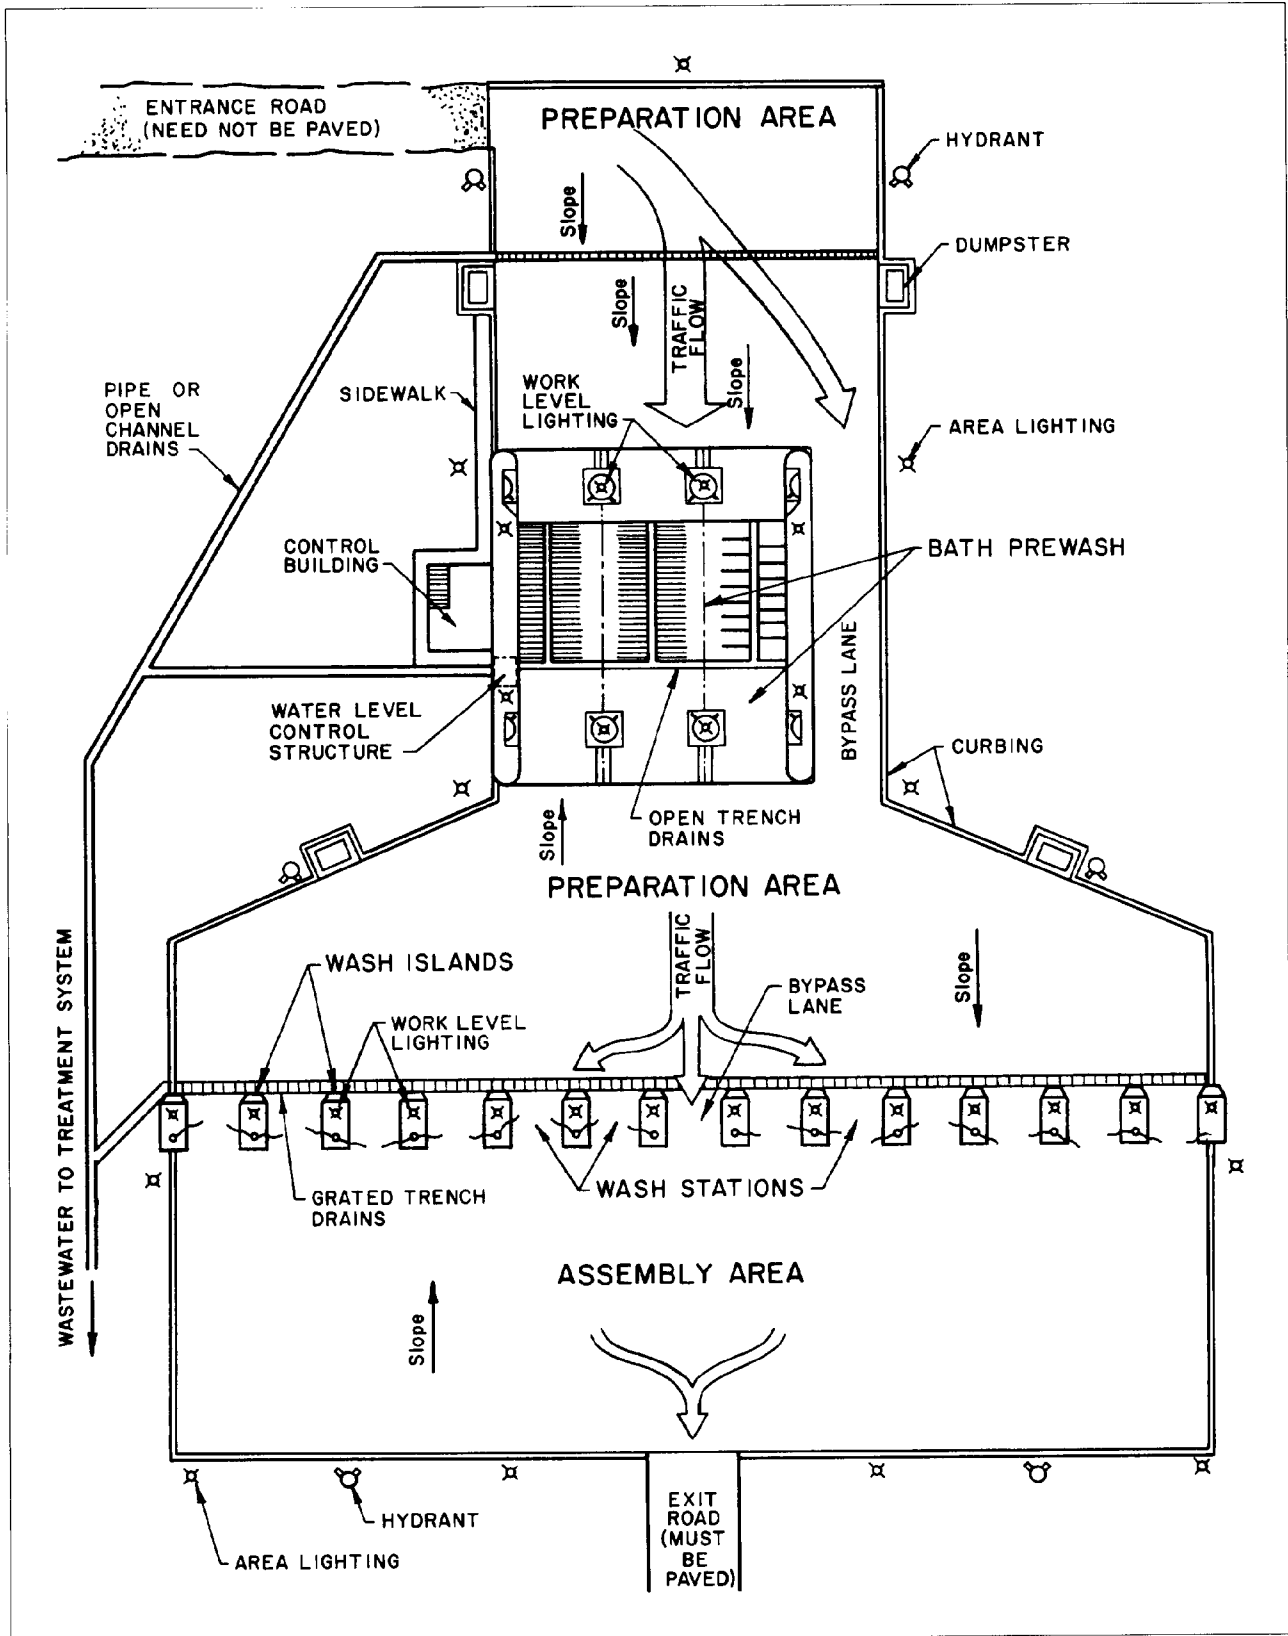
Central vehicle wash facility plan with bath prewash.
